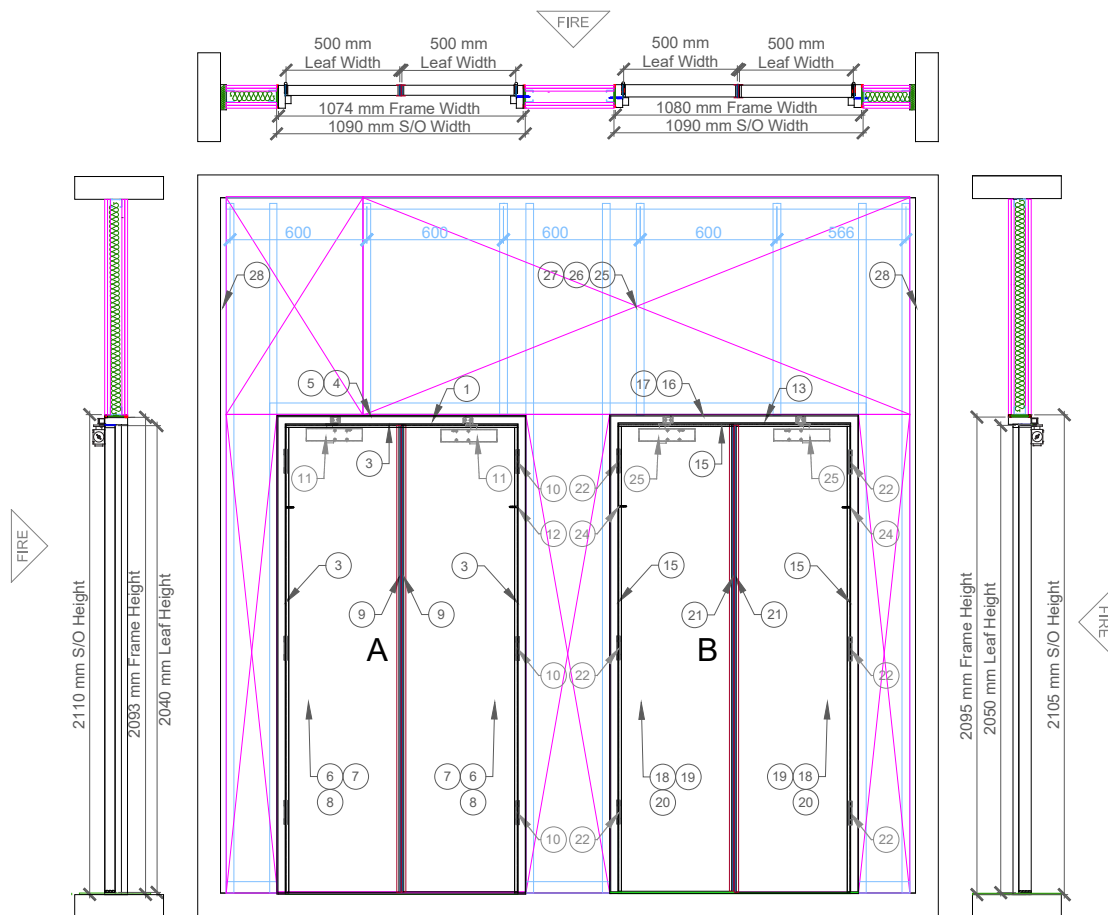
General arrangement of test construction viewed from the unexposed surface
